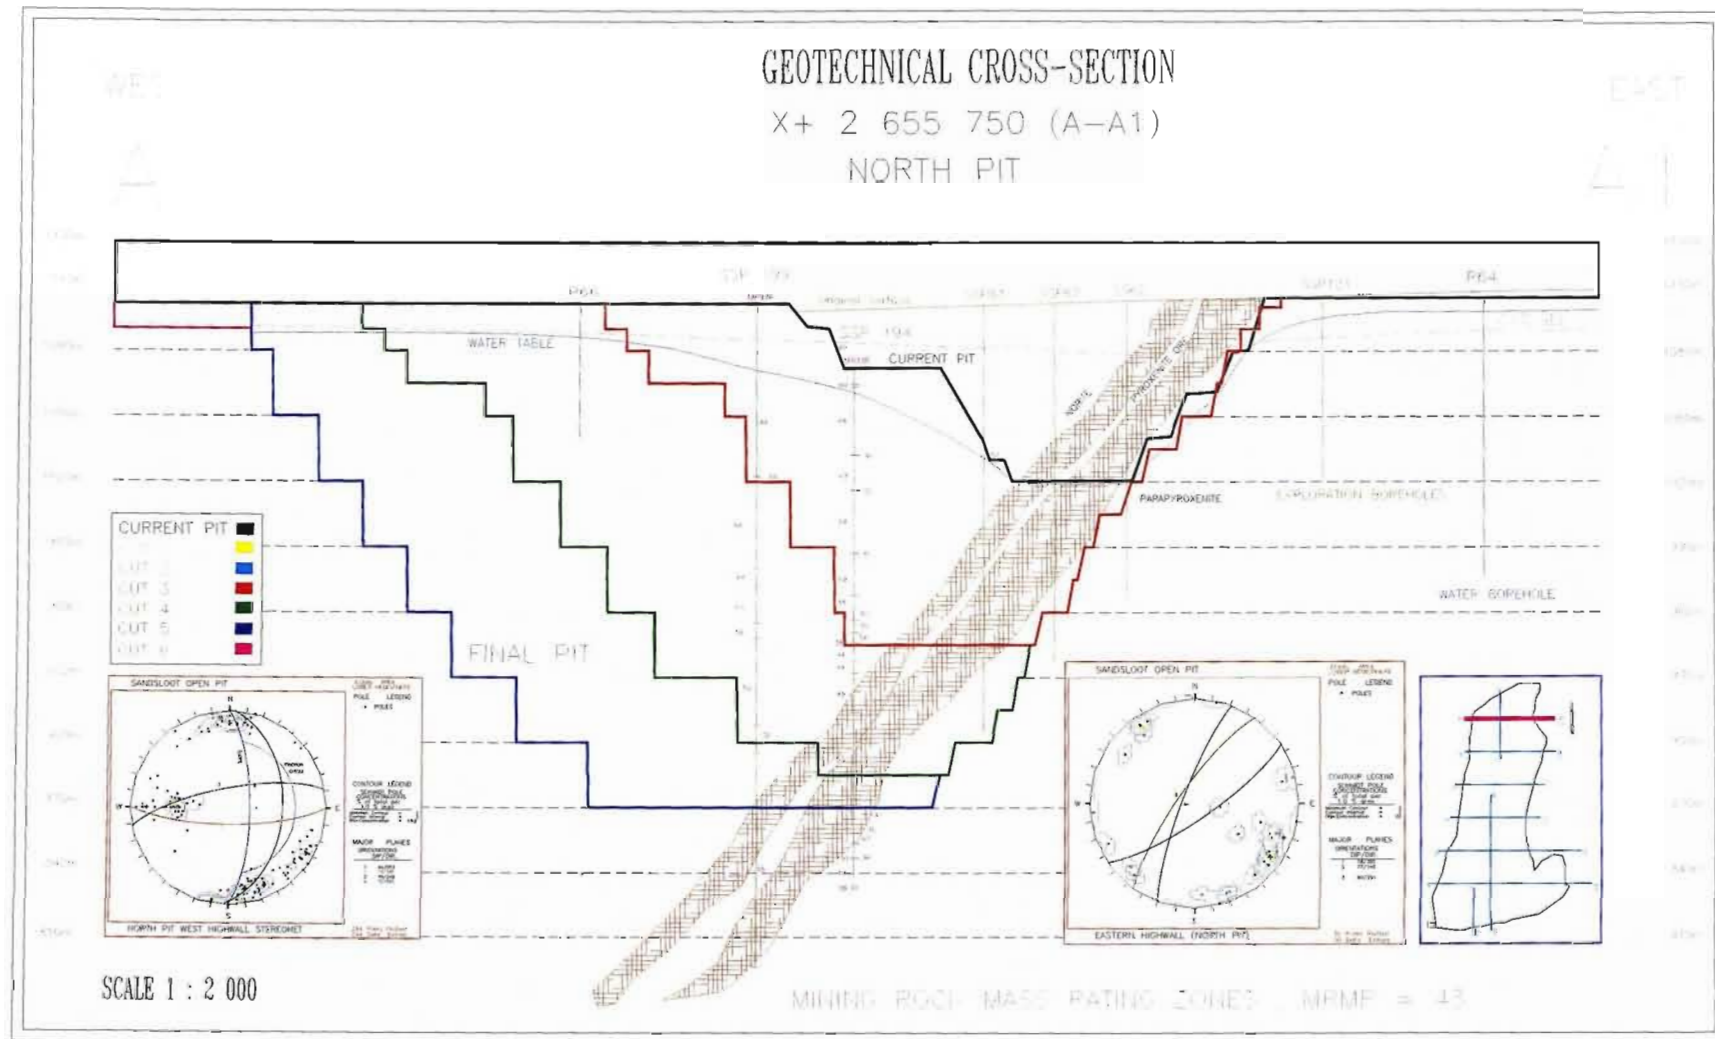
Geotechnical cross-section of Sandsloot open pit.
